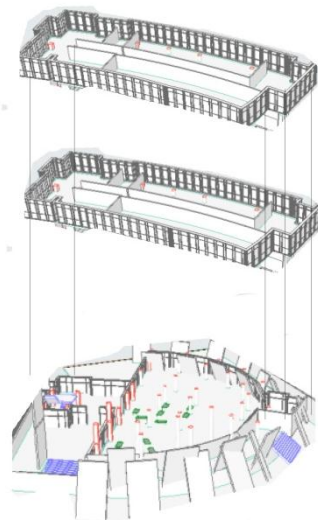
Bethlehem plaza and hidasse buildings 3 selected floors
